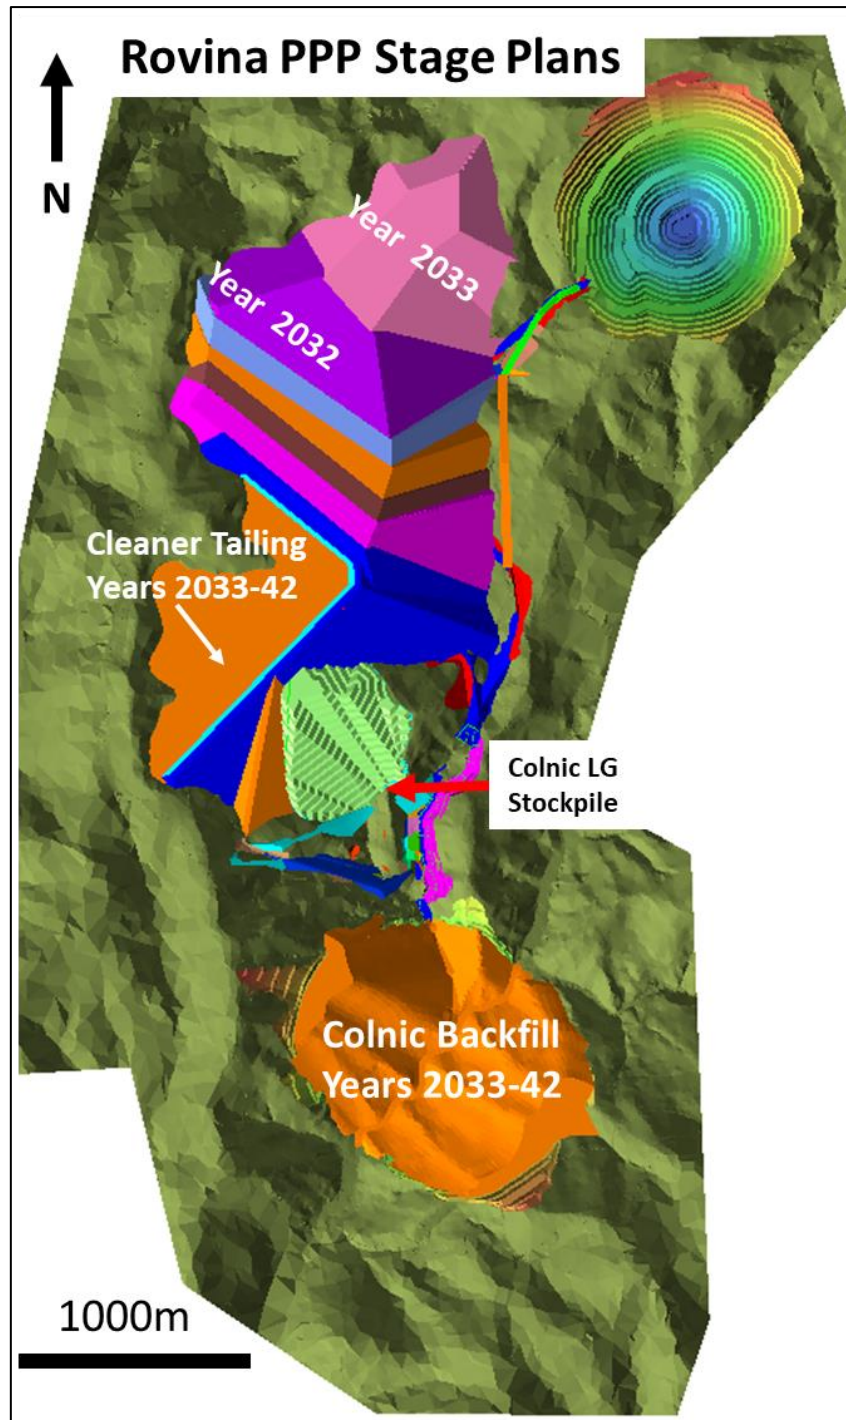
Rovina Pit and Co-Disposal Storage Facilities and Stockpiles
